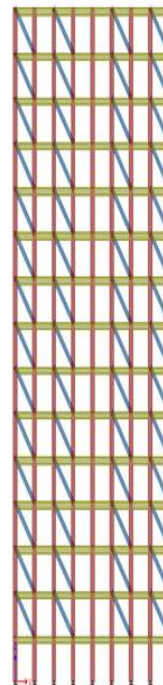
Steel Framed model of building with Diagonal-Brace
